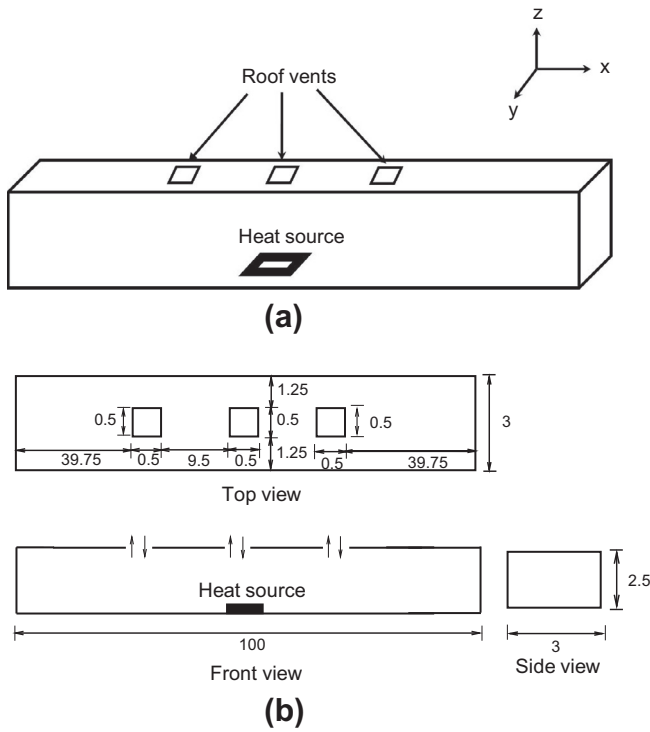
Schematic diagram of tunnel with roof openings (a) 3-D view and (b) 2-D view (dimensions in m).
